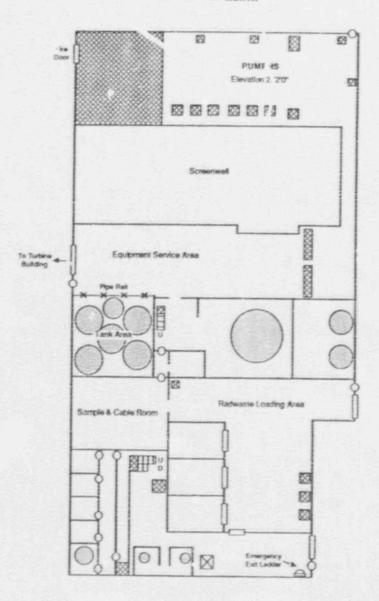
Screenwell, Water Treatment, and Radwaste Buildings, Elevation 272'0"
